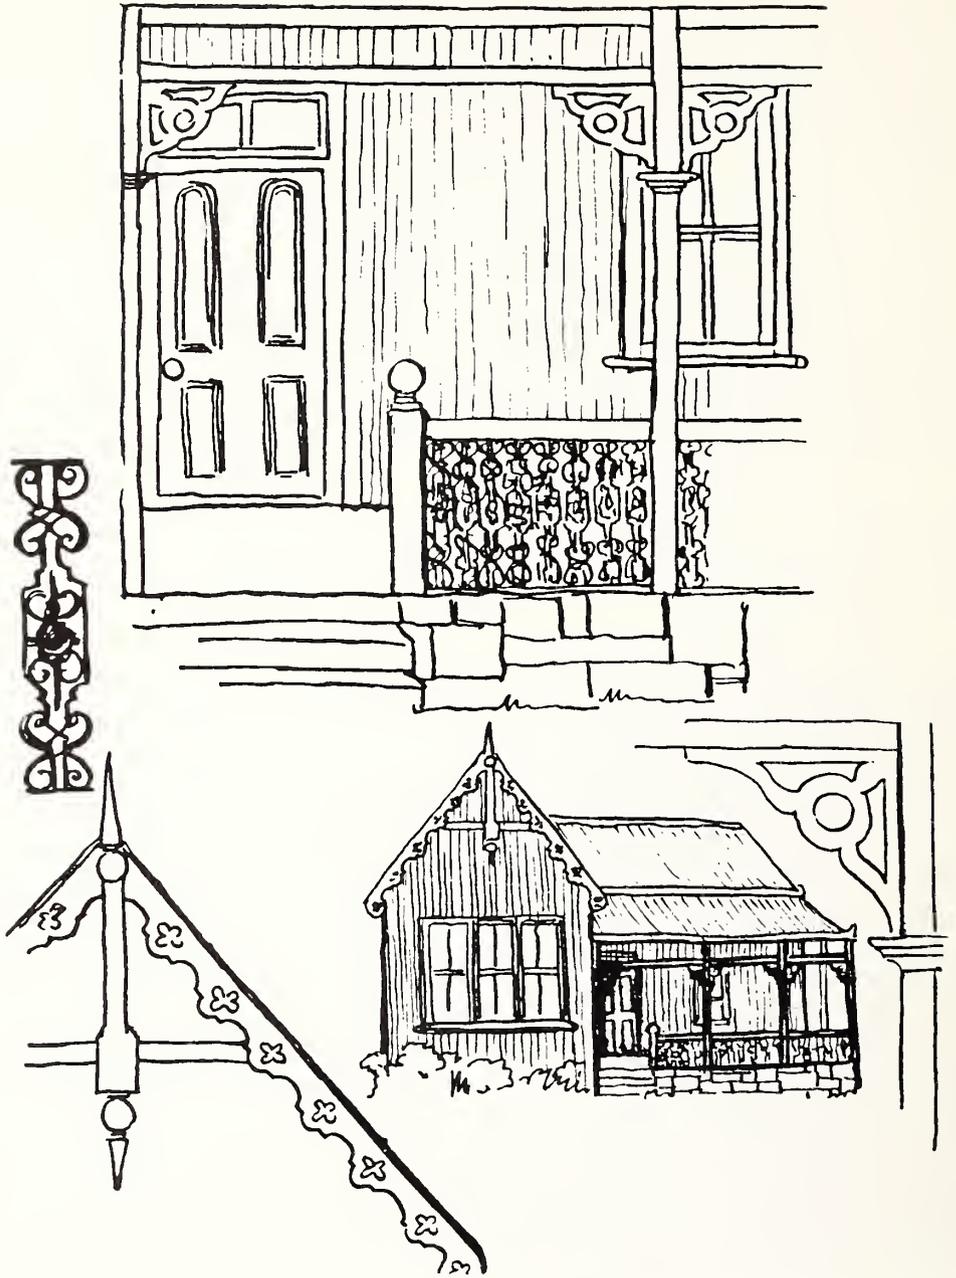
Wood and iron house which was on the corner of Hill and Cambridge Streets. Now demolished.
